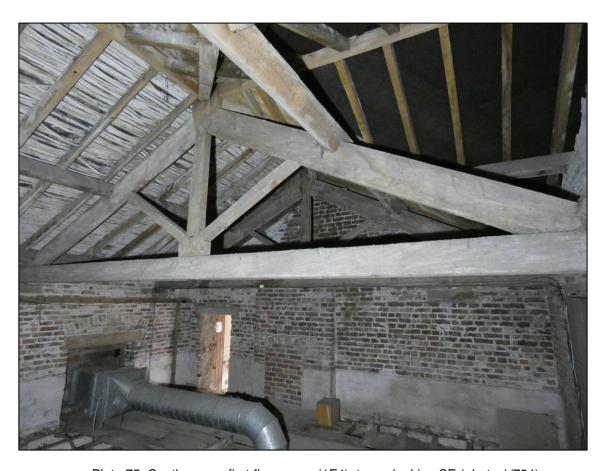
South range, first floor room (1F4), truss, looking SE (photo 1/784).
